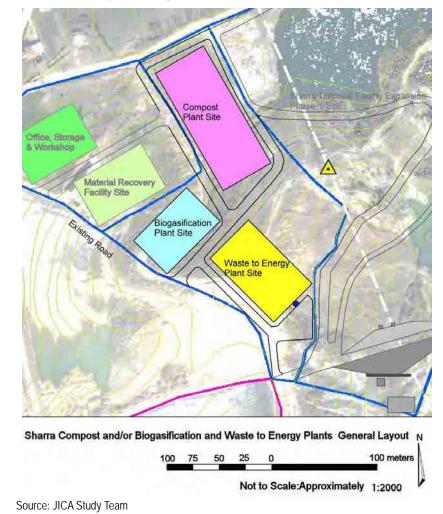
Proposed Construction Site of Compost and/or Biogasification Plants
